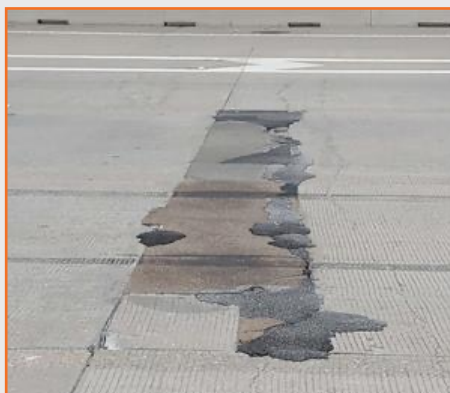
SRT concrete pavement deterioration SBML north of Hardin Blvd./ Chelsea Blvd.
